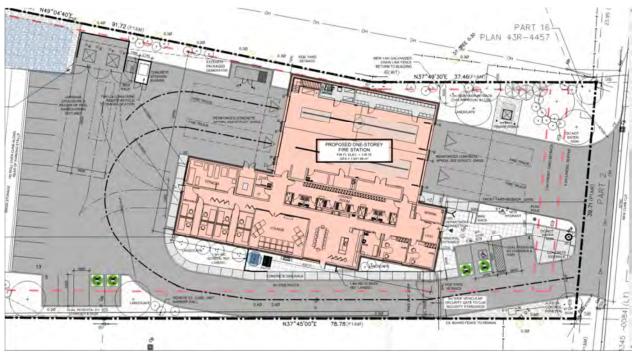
Site Plan layout for Fire Station 124. Source Mississauga.
